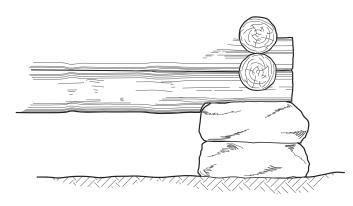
This drawing shows a stone pier constructed of flat rocks supported directly on the ground surface, which is typical of historic log cabins. The sill log is hewn to fit the top of the pier.
